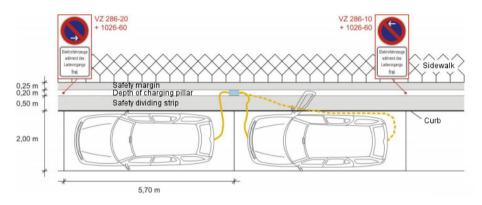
Site layout for parallel parking given in [663] (translated)
